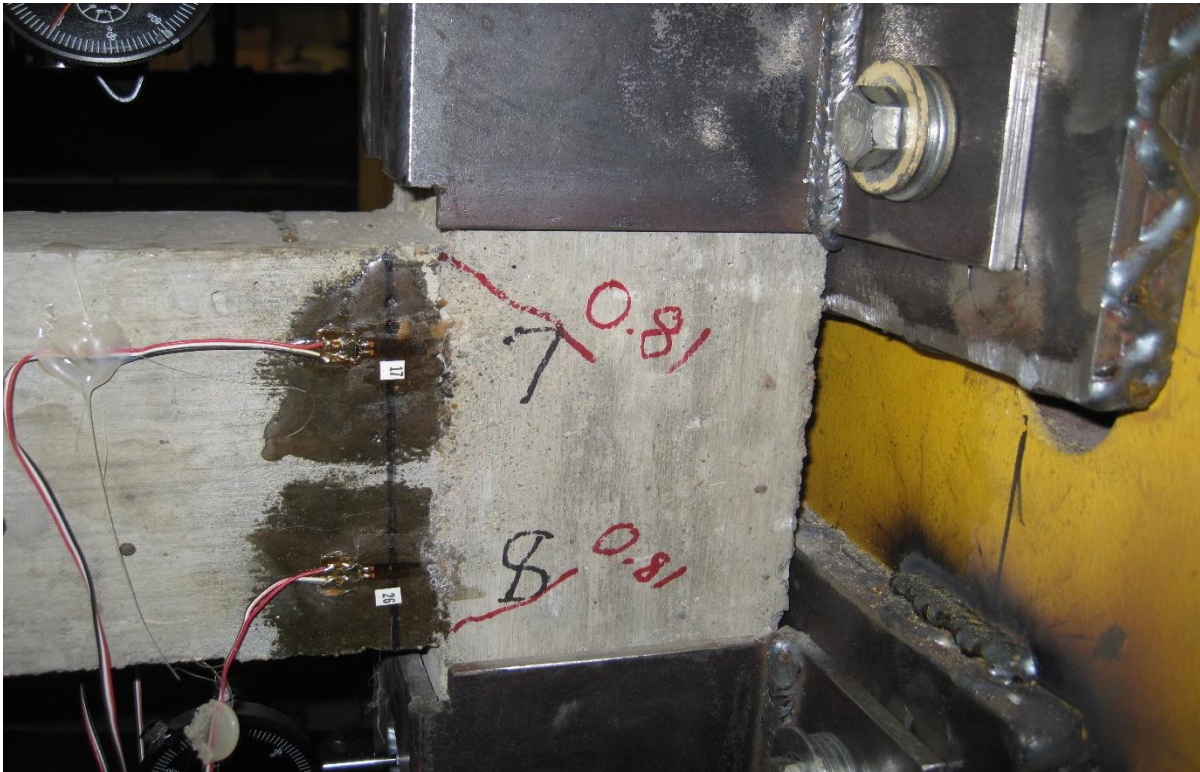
Right Support Crack pattern for Sub-assembly B2-1
